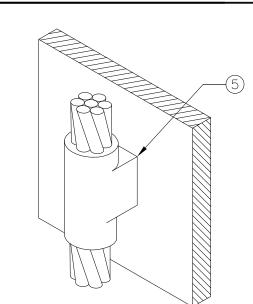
C — HORIZONTAL THROUGH WIRE TO A HORIZONTAL STEEL SURFACE. WIRE ON THE SURFACE.
